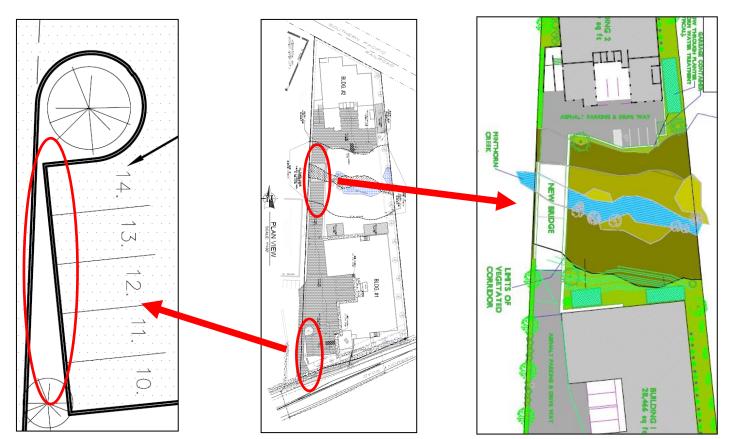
Perimeter landscaping at southwestern parking area—less than 2 ft wide adjacent to stall 14 and less than 6 ft wide adjacent to other several other stalls
